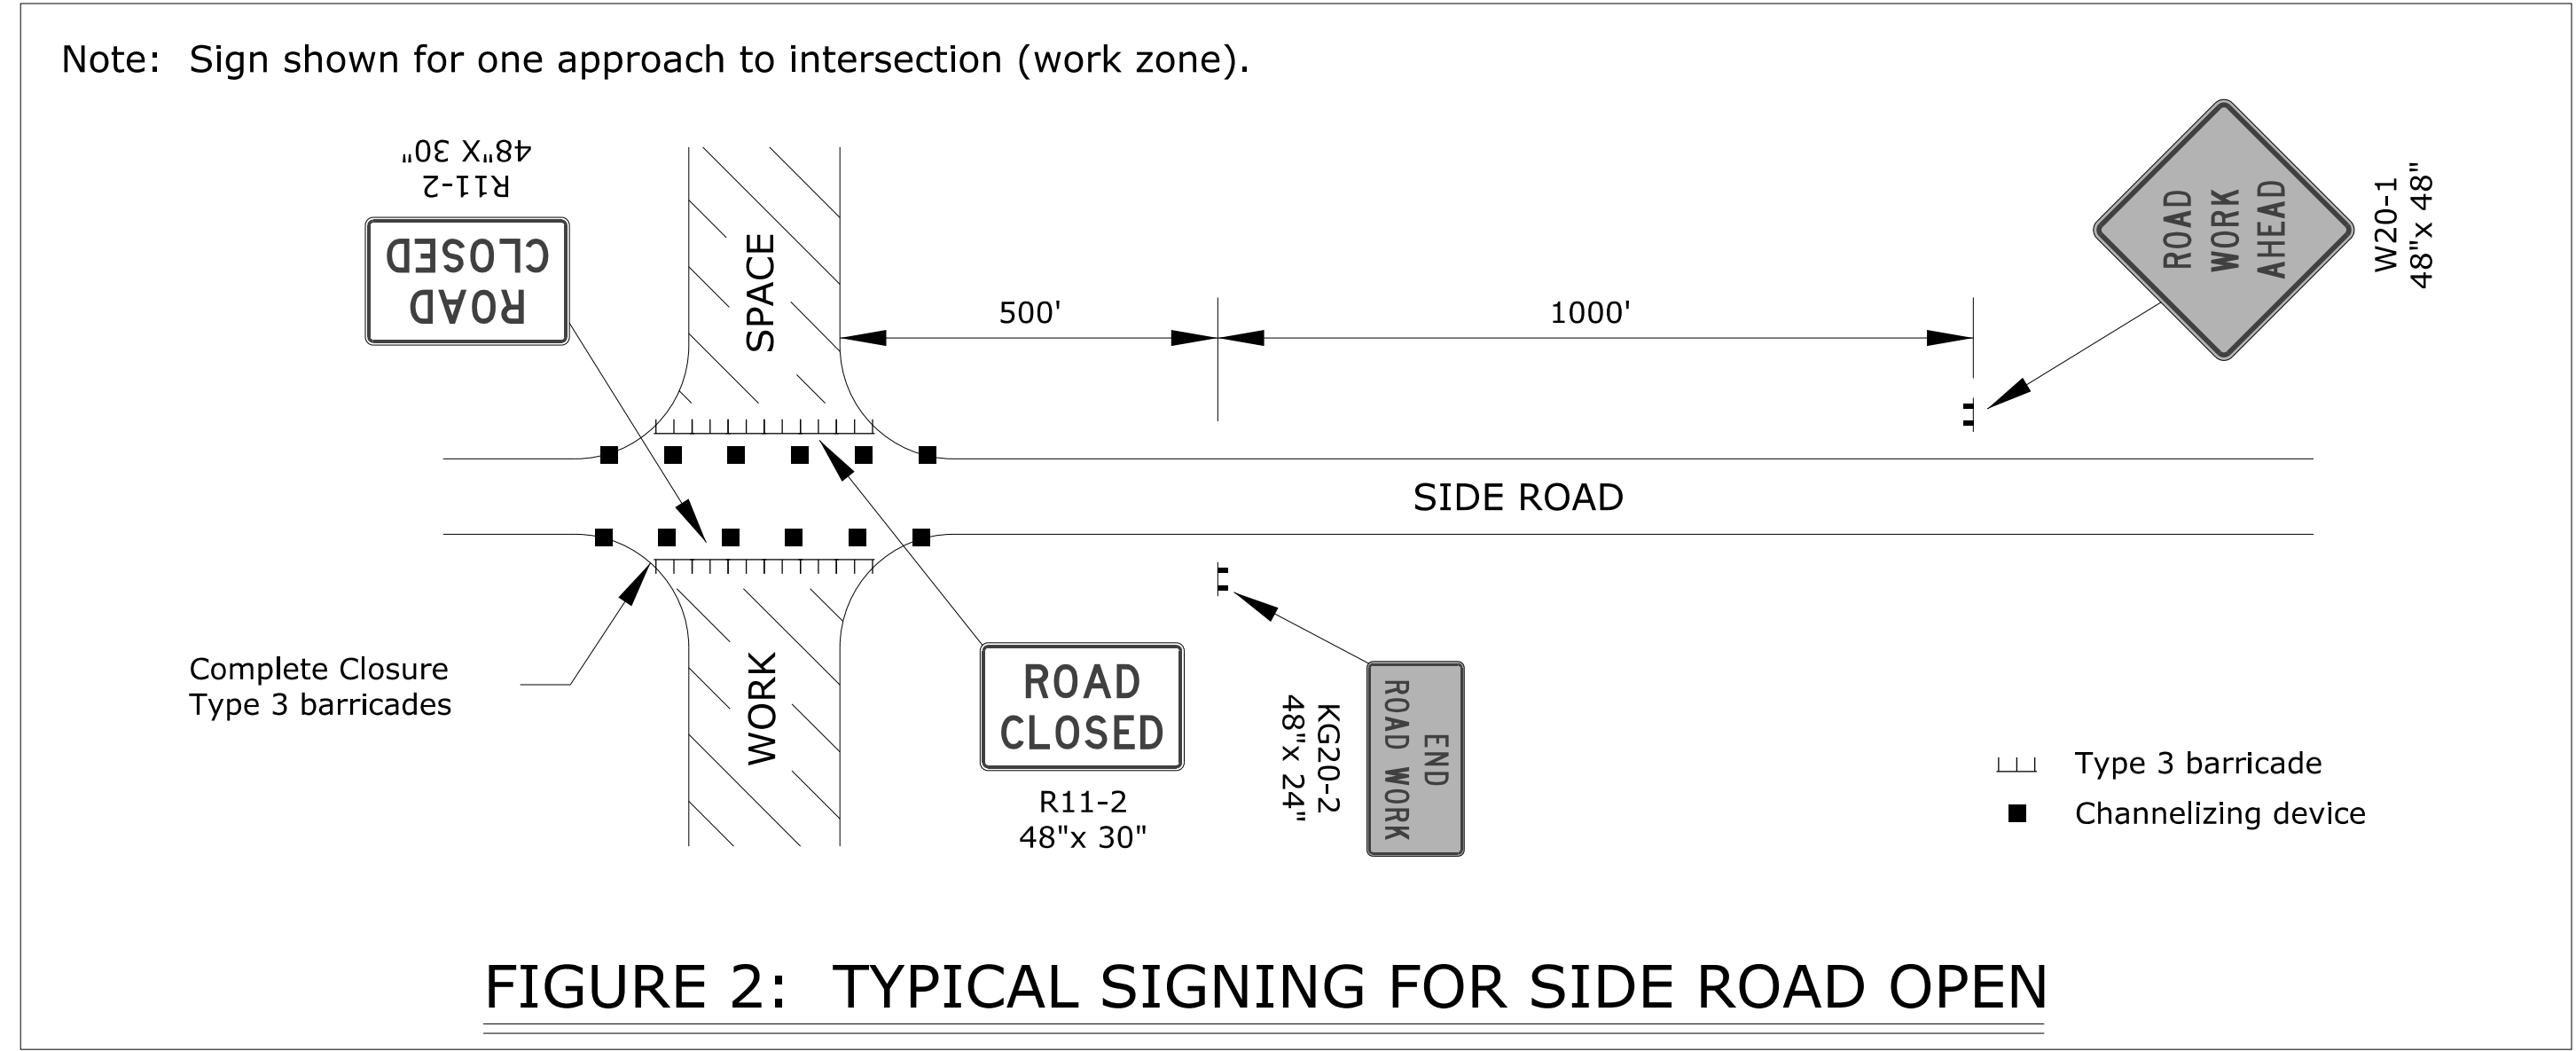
TYPICAL SIGNING FOR SIDE ROAD OPEN
